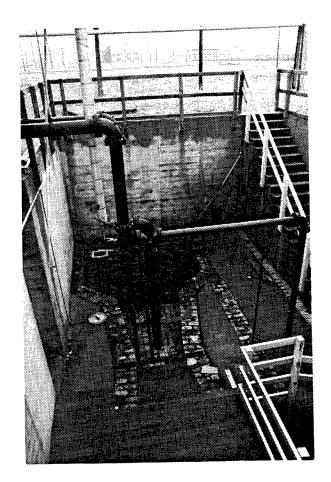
Building 420-6: Neutralizing Lime Pit for the Waste Acid Disposal Plant.
